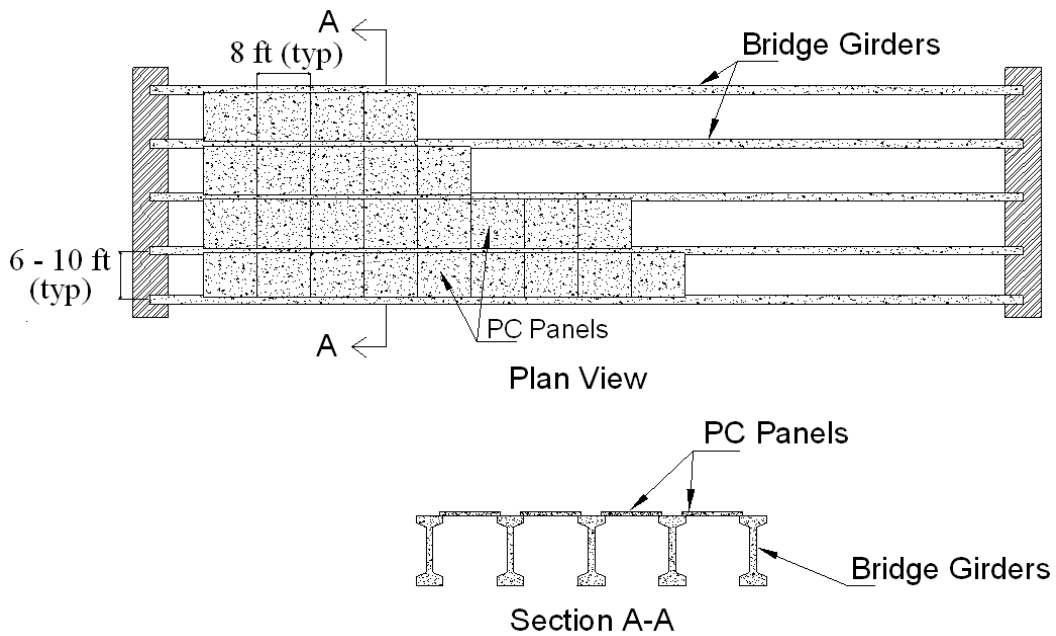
Typical Bridge Construction during Placement of Precast Panels
